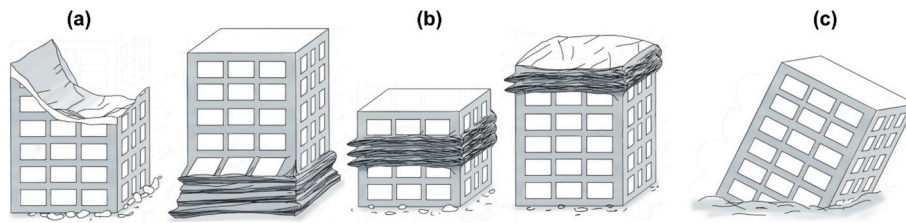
Examples of global damage patterns for extreme damage: (a) inclined plane due to collapse of structural elements on one side, (b) pancake collapse of one or more floors (bottom/middle/top), and (c) inclination of the whole building.
